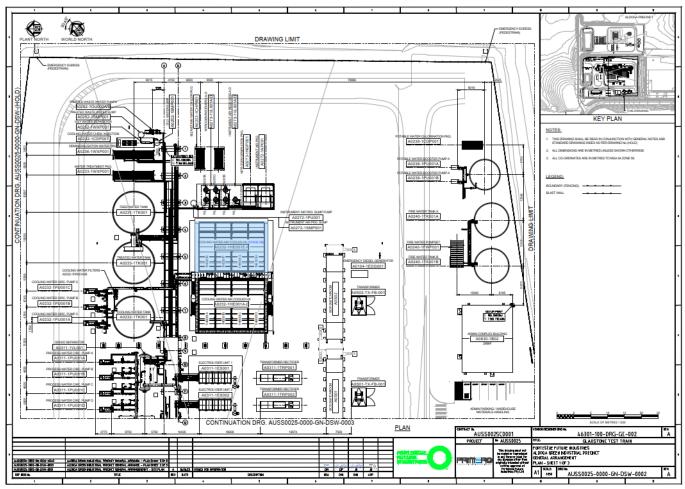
Upper Bench Site Plan (East) Source: Primero
